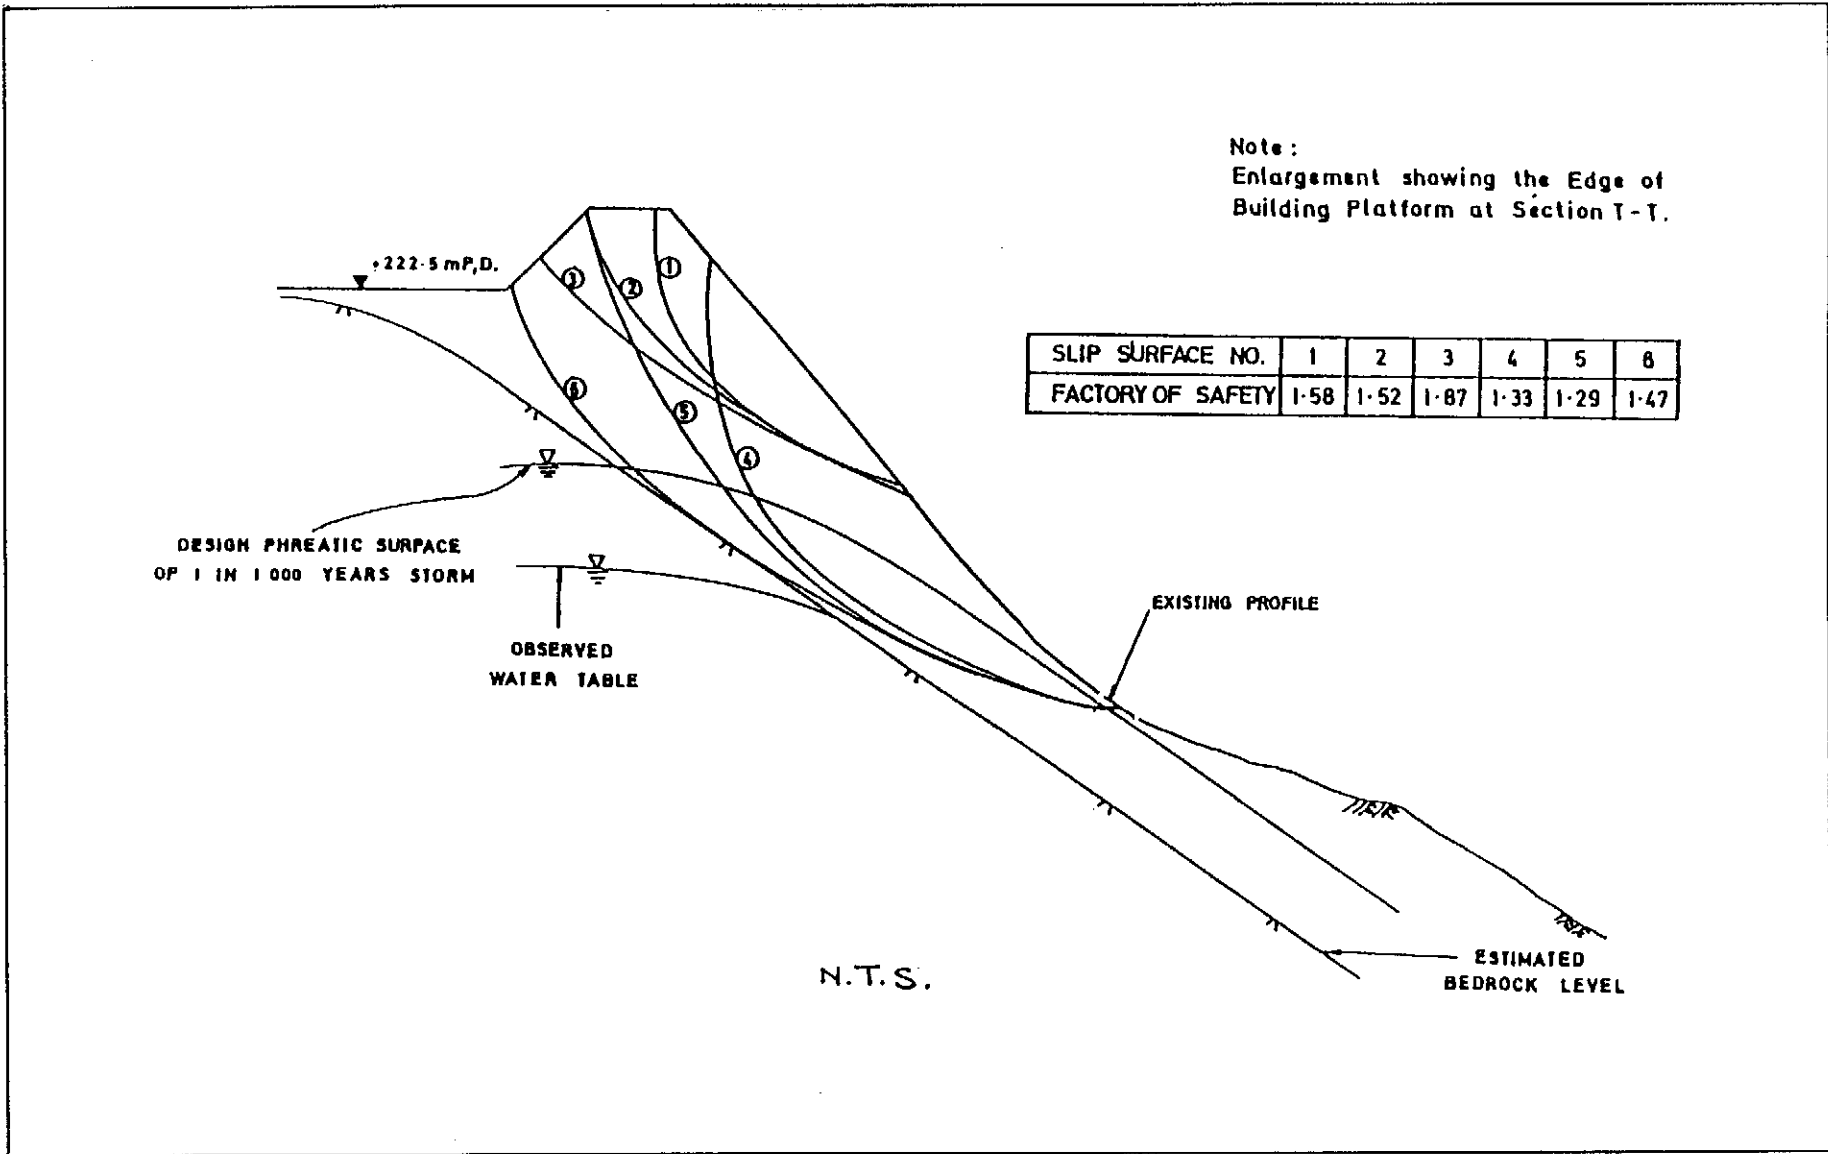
Stability Cross-section 1 - 1 (FFP, 1982)
